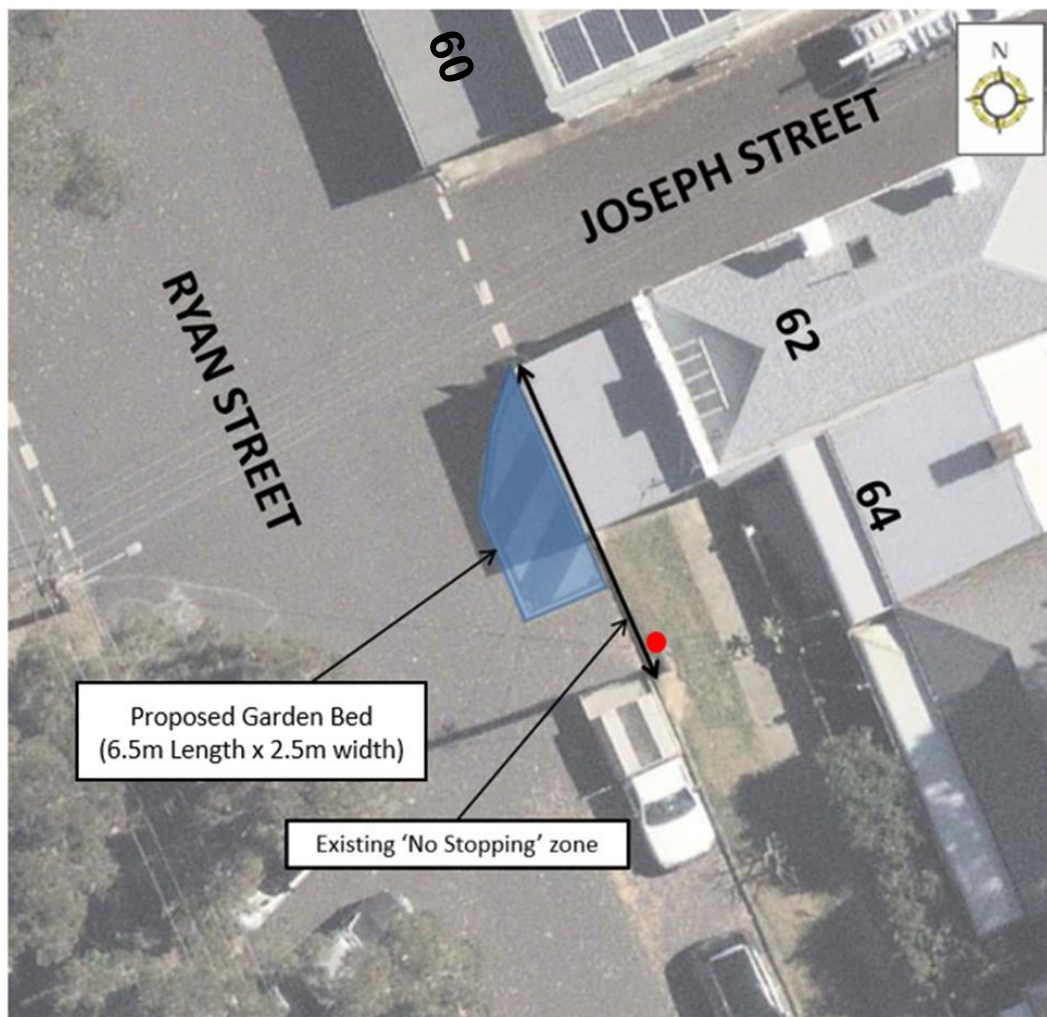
Proposed Kerb Blister Island at Joseph Street and Ryan Street, Lilyfield
